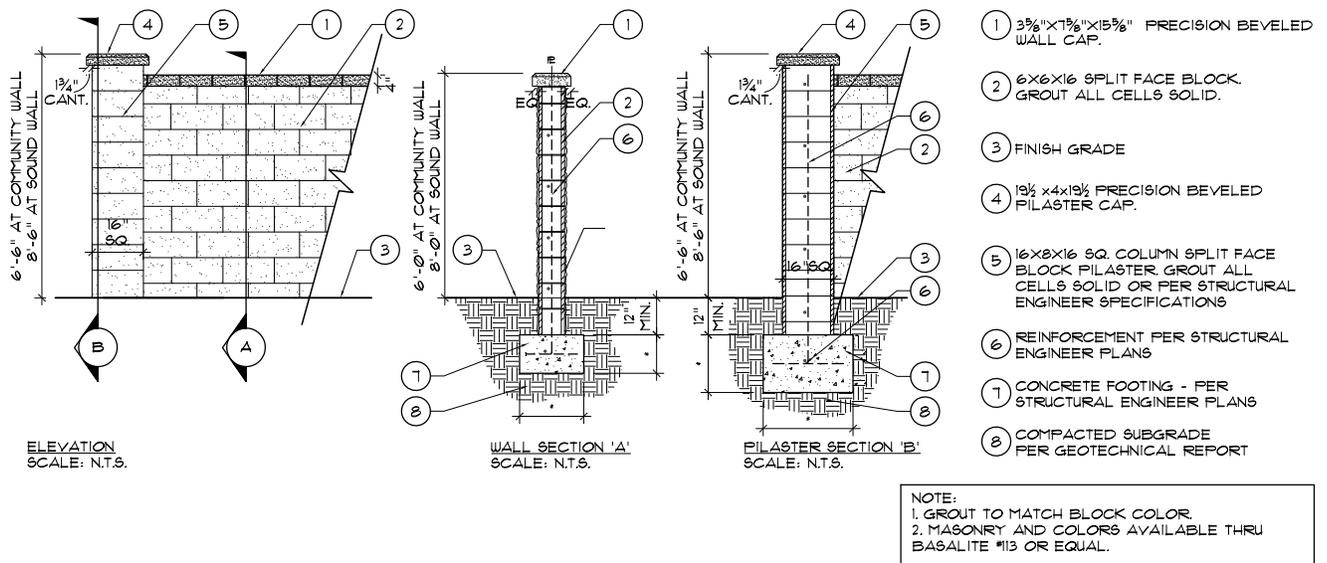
6'-0" Builder Block Wall or 8'-0" Sound Wall
